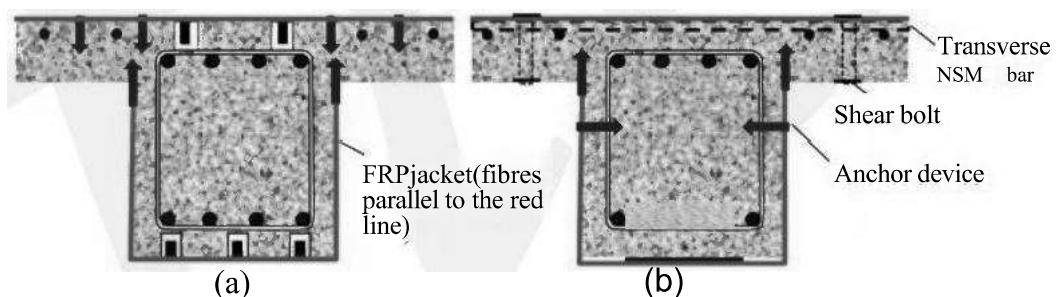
Various types of flexural strengthening of T-beam cross sections by addition of longitudinal NSM or EBR reinforcement. The outer solid line illustrates jacket arrangements required to secure the flexural intervention. Due to the presence of slab longitudinal reinforcement, addition of top reinforcement is more rarely needed [{see(a)}; here it is important to provide transverse top reinforcement to secure the participation of slab reinforcement in beam flexural strength [see dashed line in(b)].
